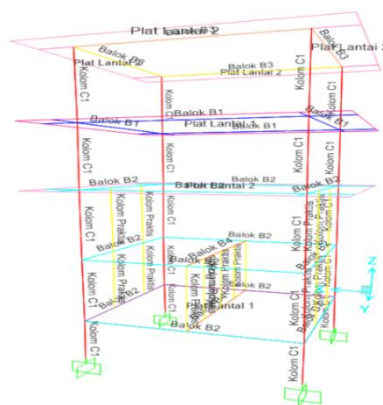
Building Structure Modelling of the SCADA Building in SAP2000.
